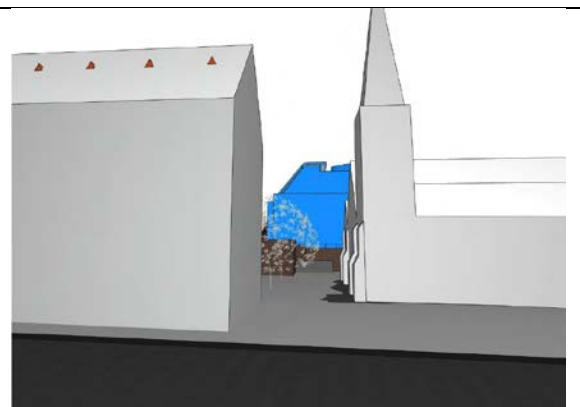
| View of eastern elevation of proposed building envelope, from Abercrombie Street
